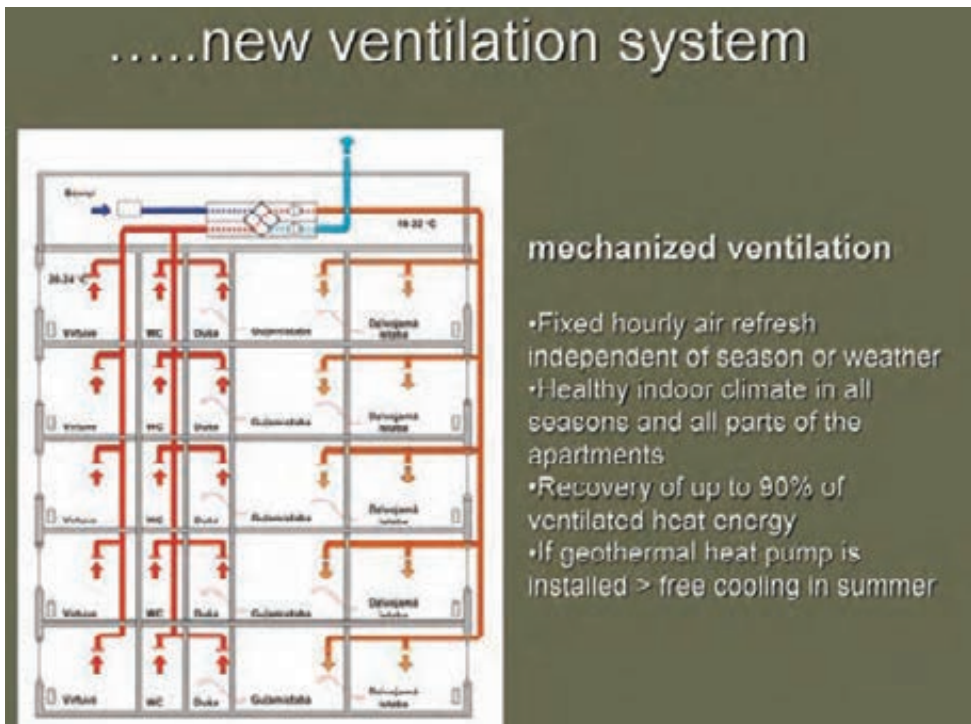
| New ventilation system in renovated building (credit: www.renesco.lv).
